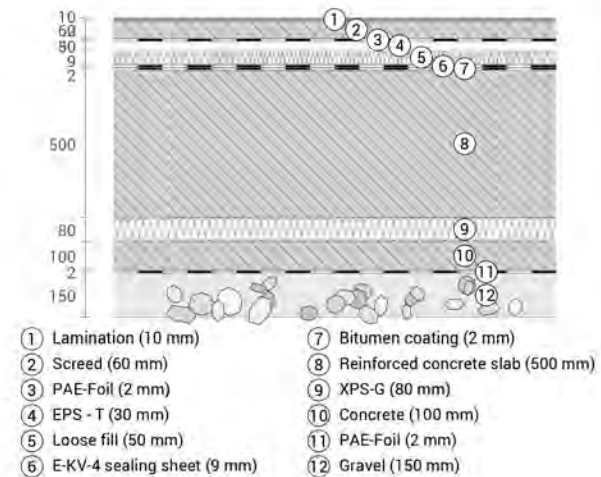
Detail of the foundation slab against heated rooms, made by the author.
